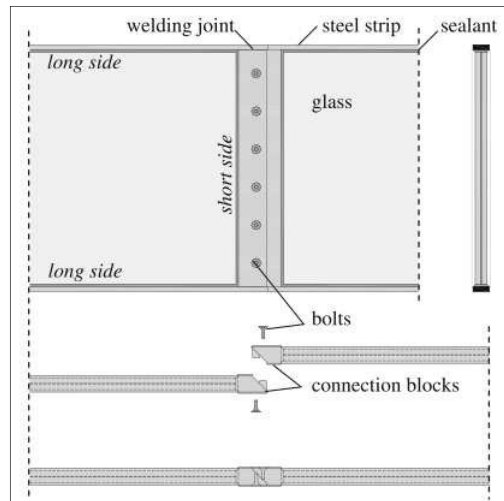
Cross section of the steel-glass beam and details of the connection (Belis, et al., 2009).
